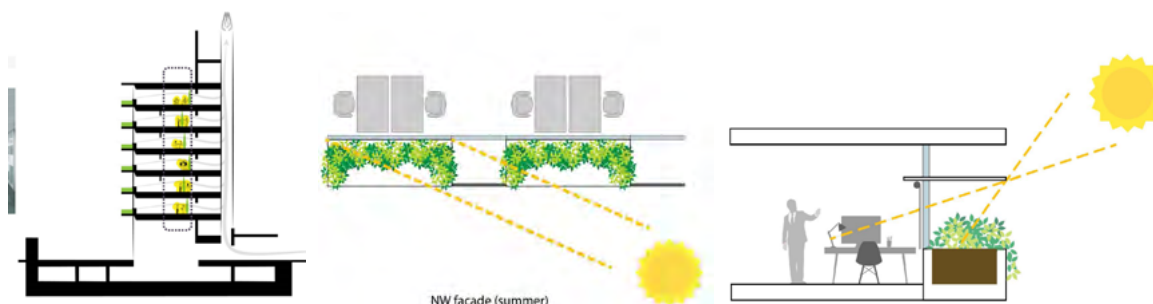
The double facade acts as a solar chimney to enhance air movement and has balconies redesigned with green walls and shading elements.
